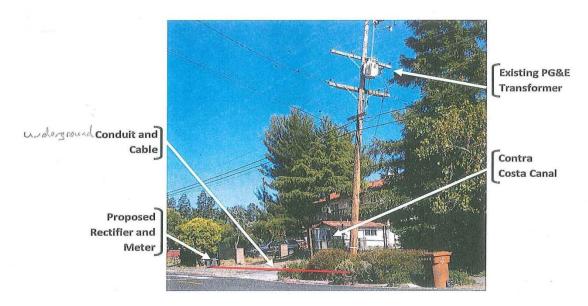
View of 565 Boyd Road, Next to Proposed Rectifier Site.
